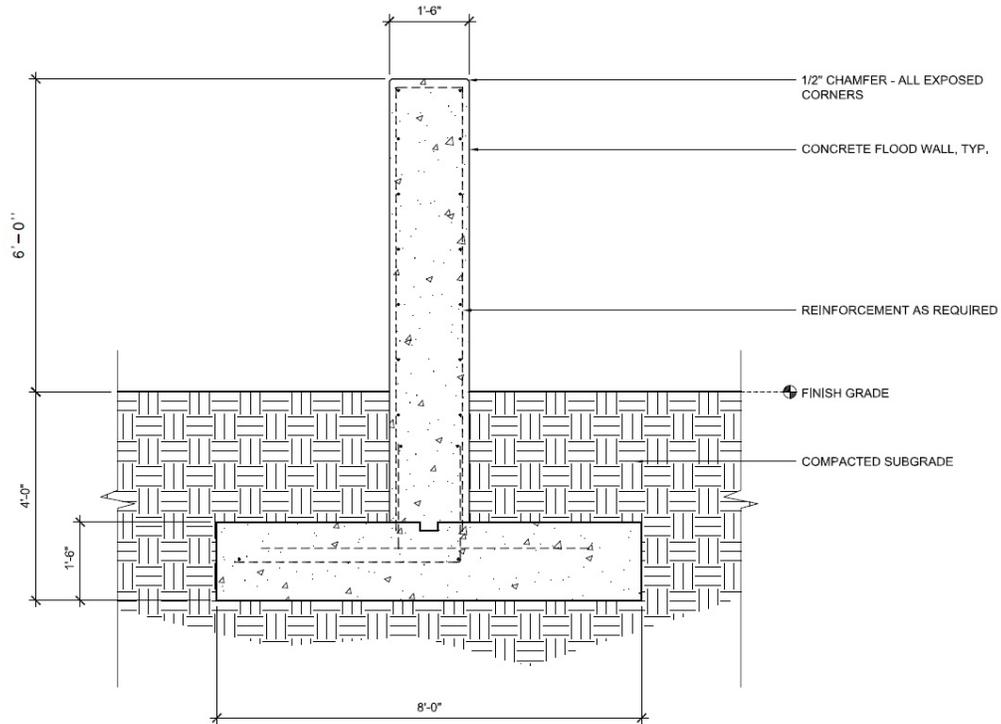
Cross-Section of 6 ft Flood Wall for Soil Areas 1 to 3
